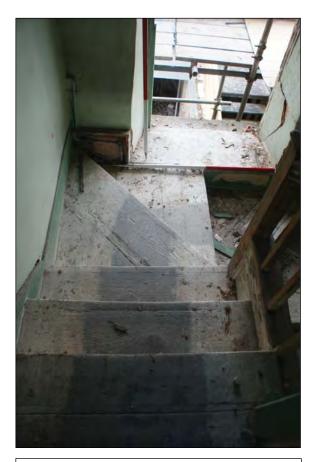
(Right) General Shot Room 4. Floor in this Room was Unsafe and Photograph was Taken From Doorway Without Scale
